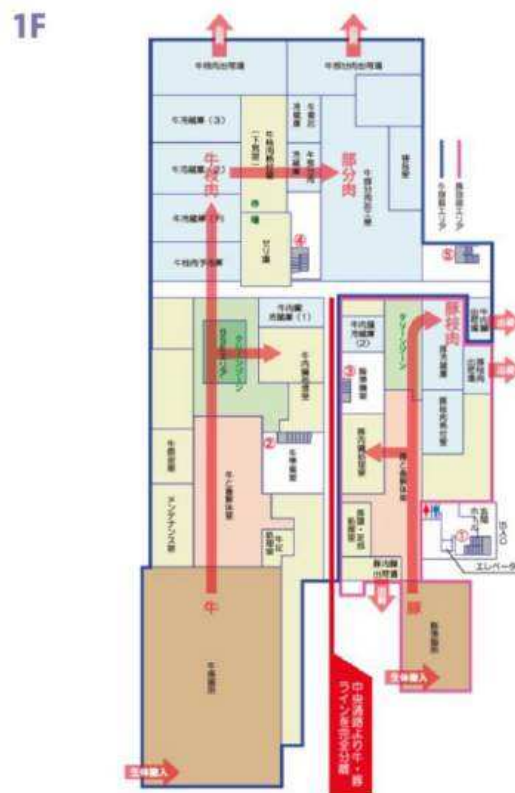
Layout of a typical slaughterhouse in Japan, where cows and pigs must be kept completely separate. (<https://shiga-shokuniku.or.jp/layout>)
